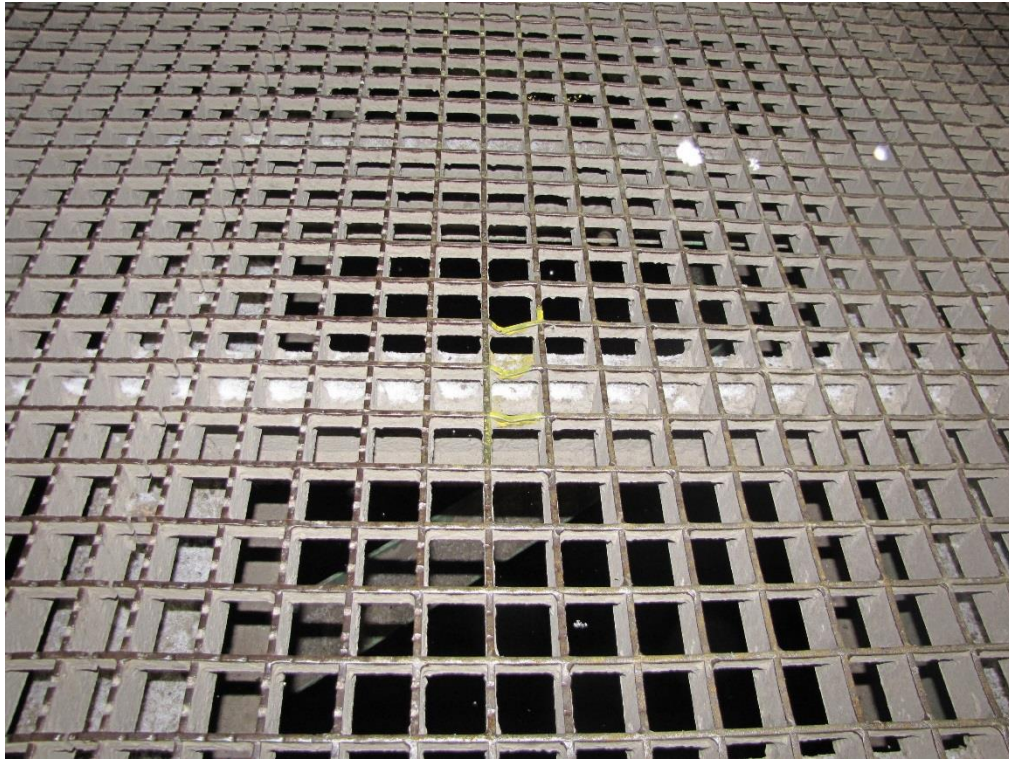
Multiple bent transverse cross-bars (C8-10 at 64-6) – typical at multiple locations
